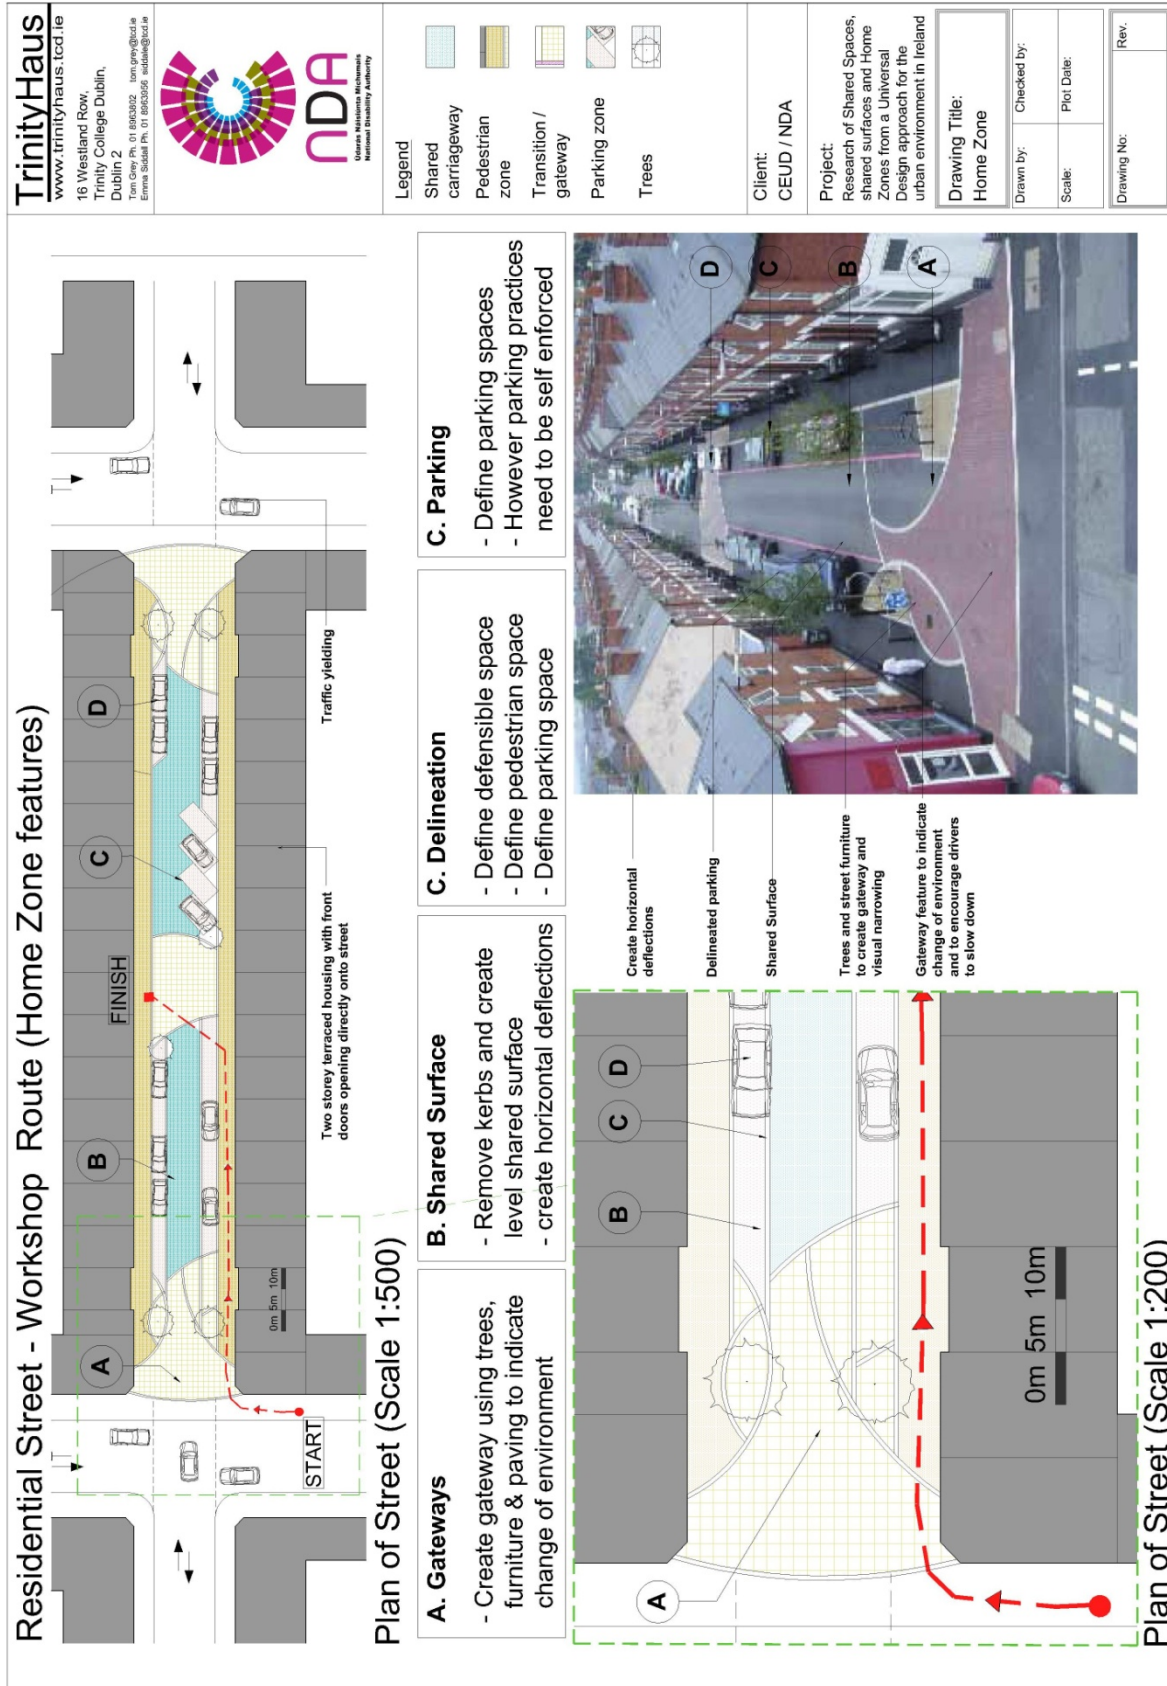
Plan drawing & photos of the Home Zone route (exercise 2, route 2)
